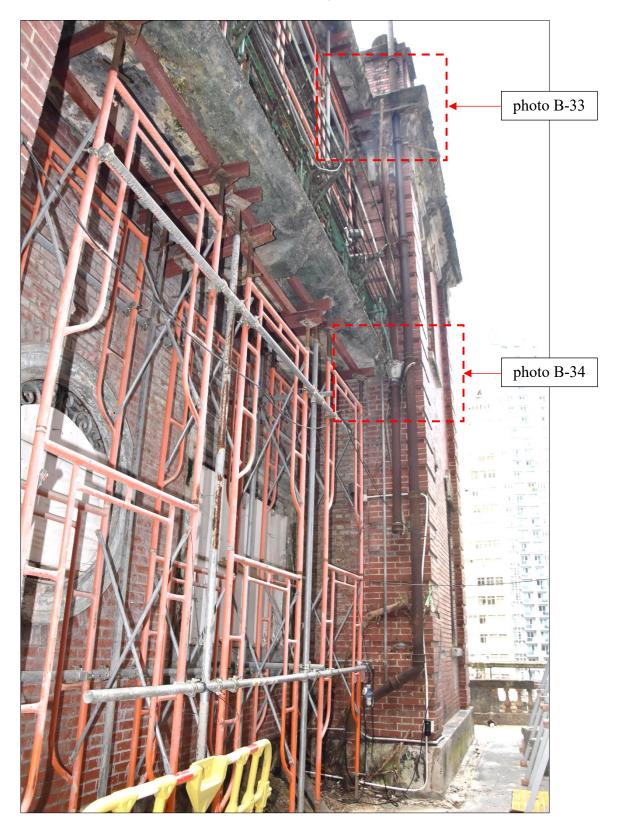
Main Building, the cast iron vent pipe and cast iron rainwater downpipe with two hoppers installed at south-east elevation (facing Ship Street) front portion, (8<sup>th</sup> October, 2024)
